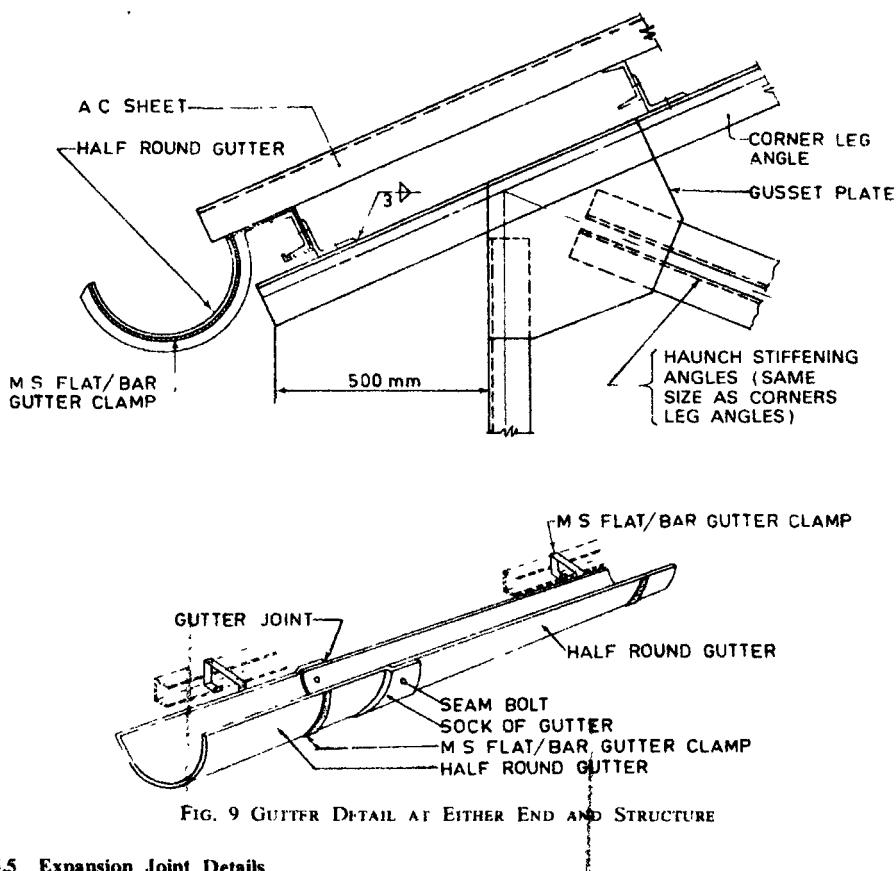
GUTTER DETAIL AT EITHER END AND STRUCTURE
